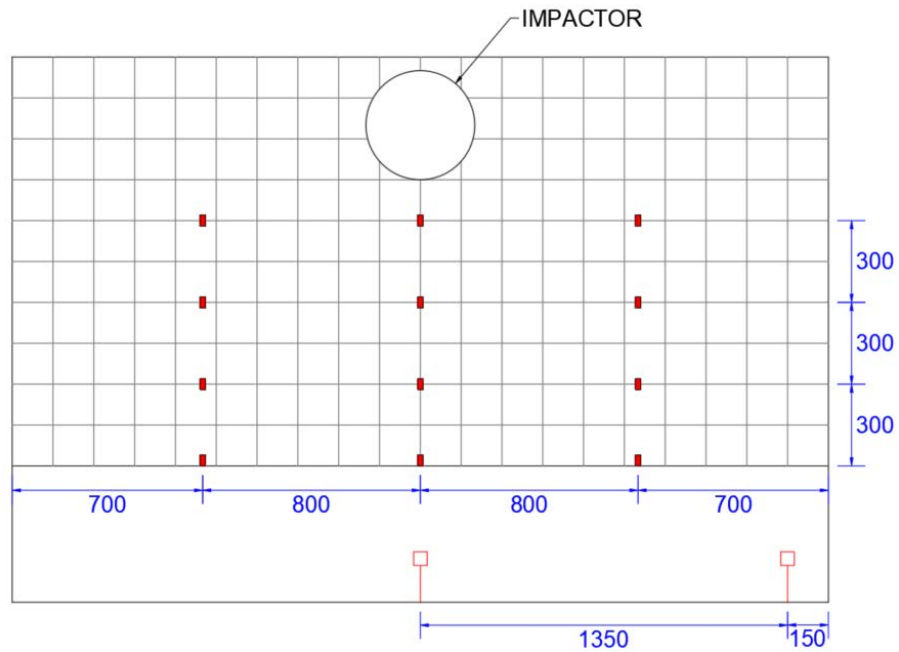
Front view (tensile side) of specimen showing instrumentations
